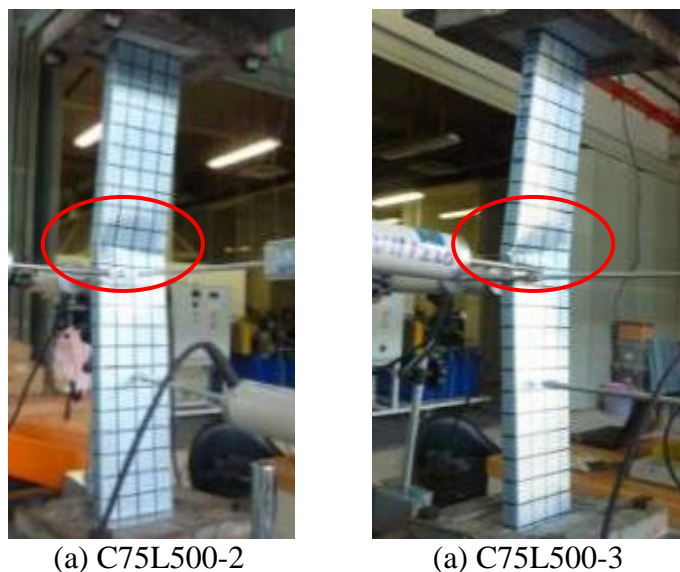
Failure Modes of Tested C75L500 C-channel Columns
